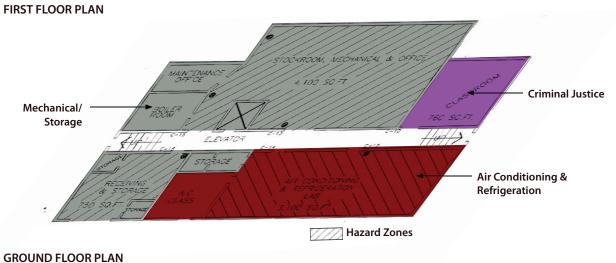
Floor Plans Indicating Department Locations in the Covington/Park Hills Campus
